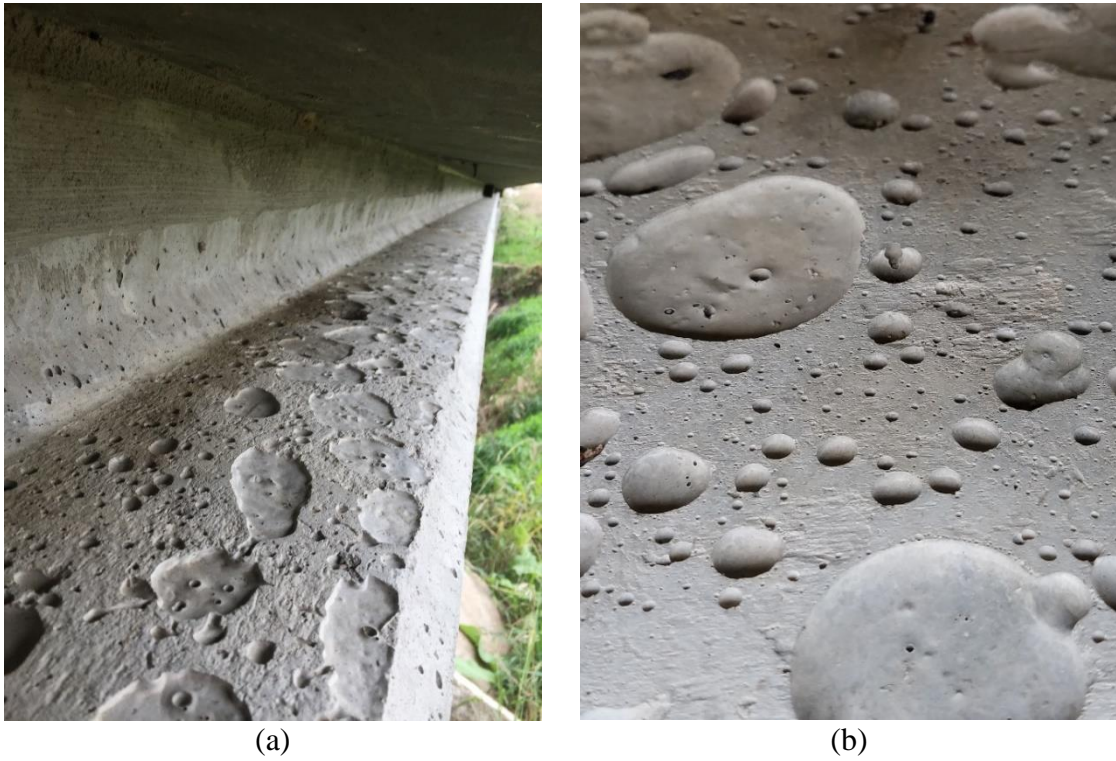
Damaged girder flange caused by water entrapment in concrete forms on bridge S006 34277.
